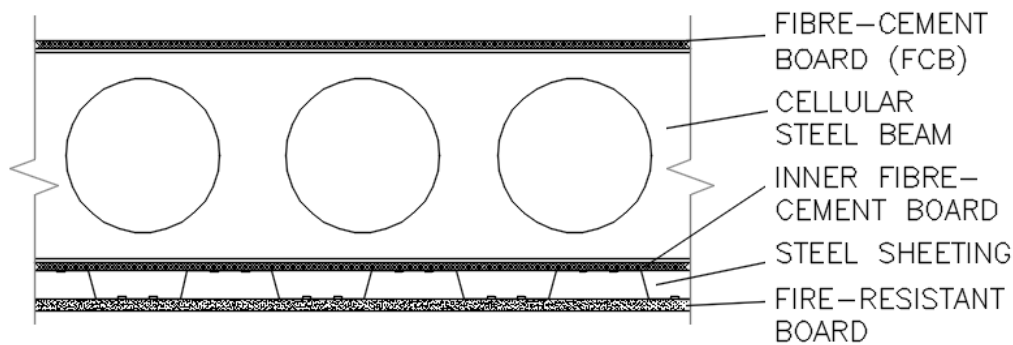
Elevation view of the sandwich floor configuration with a cellular beam section and the bottom floor layers
